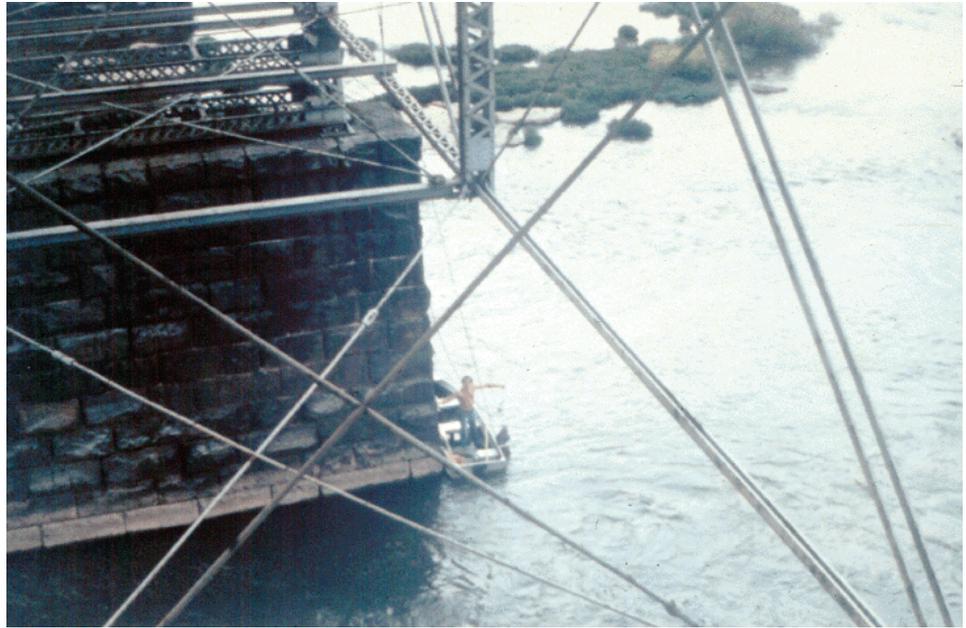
Fracture Critical Bottom Chord Truss Member: Internally Non-redundant Eyebar
